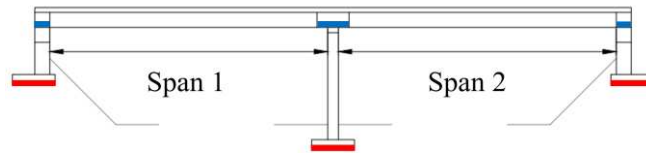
Beam and Slab bridge elevation showing whole bridge with original extents (red lines) below each support and new extents proposed atop each support (blue lines).
